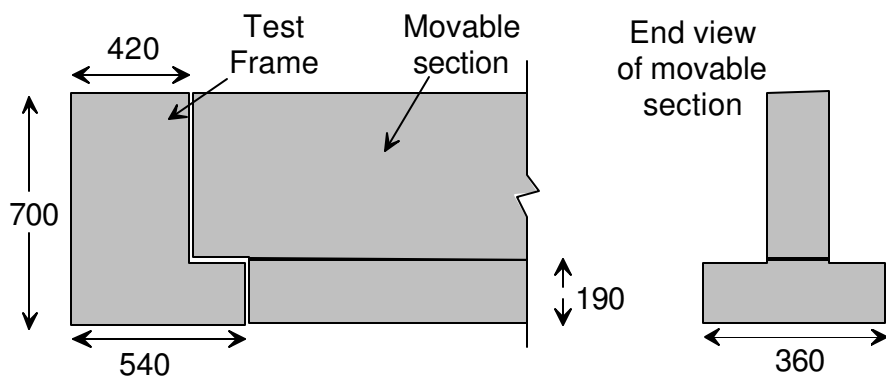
The movable concrete support used to change the floor size by supporting different joist lengths.
